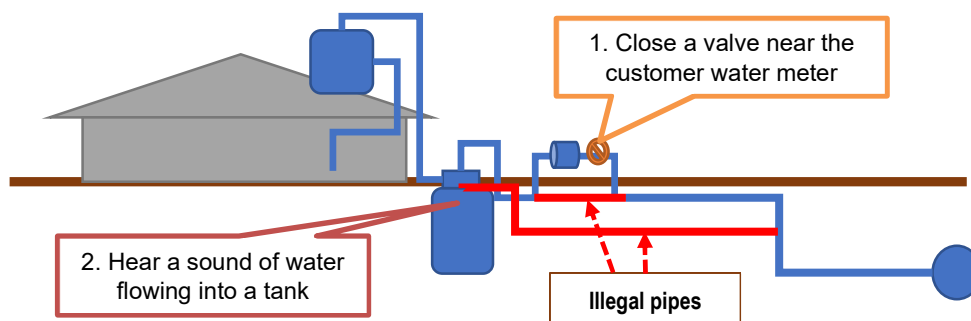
How to Find Illegal Pipe toward Underground Tank
